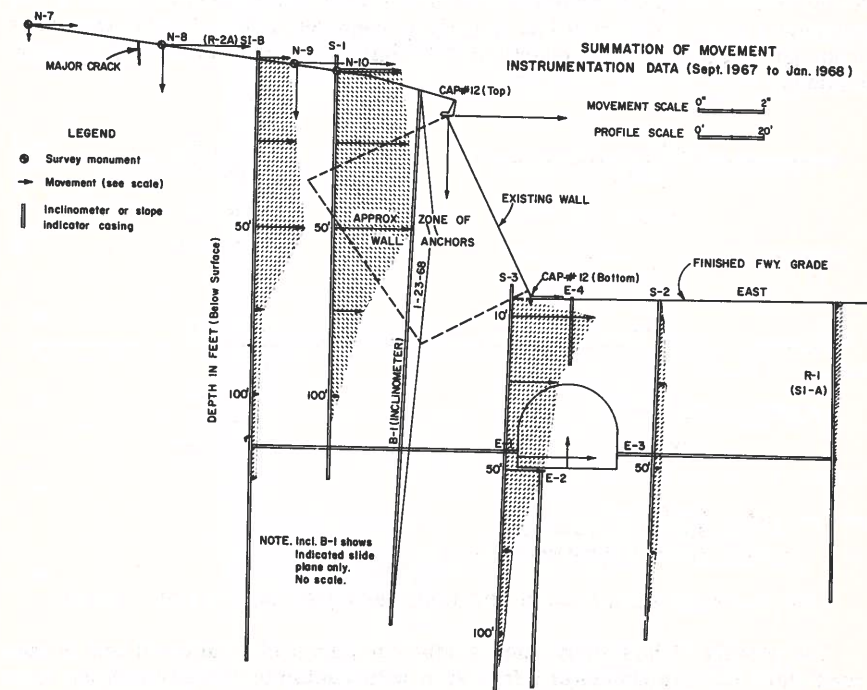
CROSS SECTION—HIGHWAY STATION 433±, RAILROAD STATION 690±
